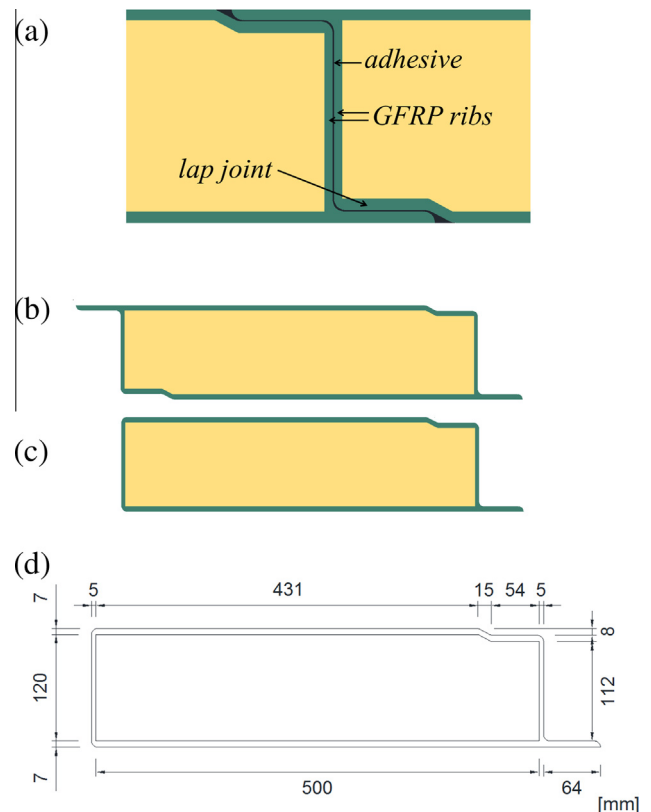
Proposed panel-to-panel connection system: (a) joint components, (b) interior panel cross-section, (c) end panel cross-section, and (d) cross-sectional dimensions.
